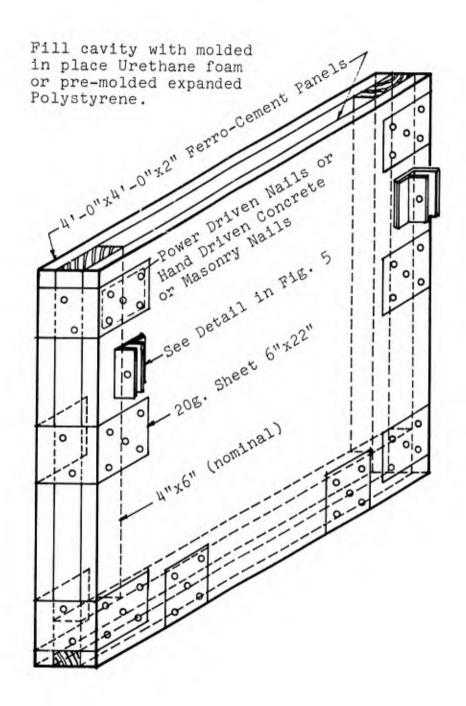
SANDWICH MODULE FOR PIER FENDERS
